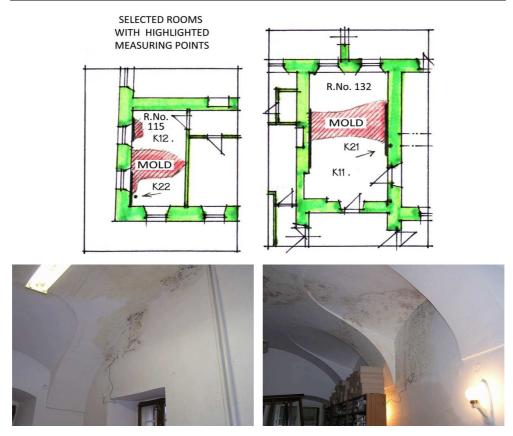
Views of mildew occurrence in rooms No. 115 and 132 with positioned sensors
